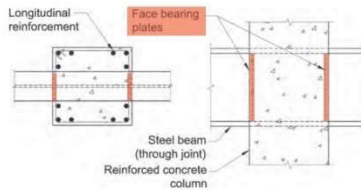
Reinforced concrete column-to-steel beam moment connection.
